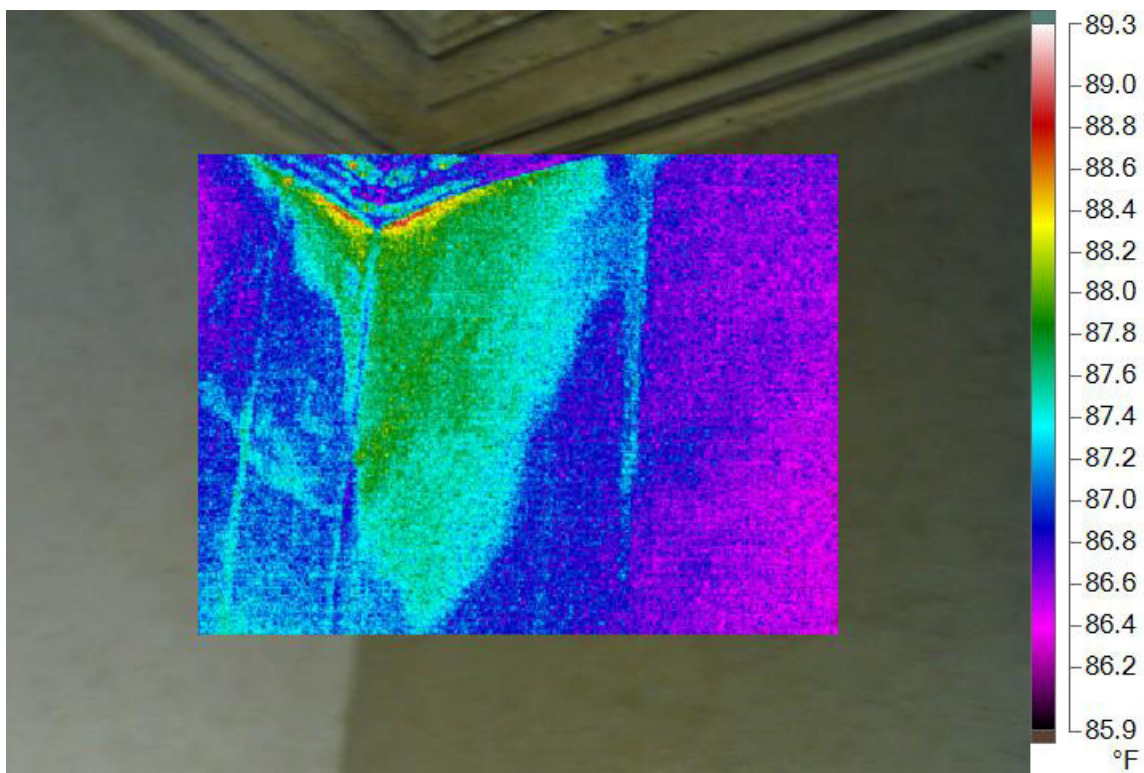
Southeast chamber, northwest corner: Note: Areas illustrating detachment of wallpaper without noticeable plaster damage.
